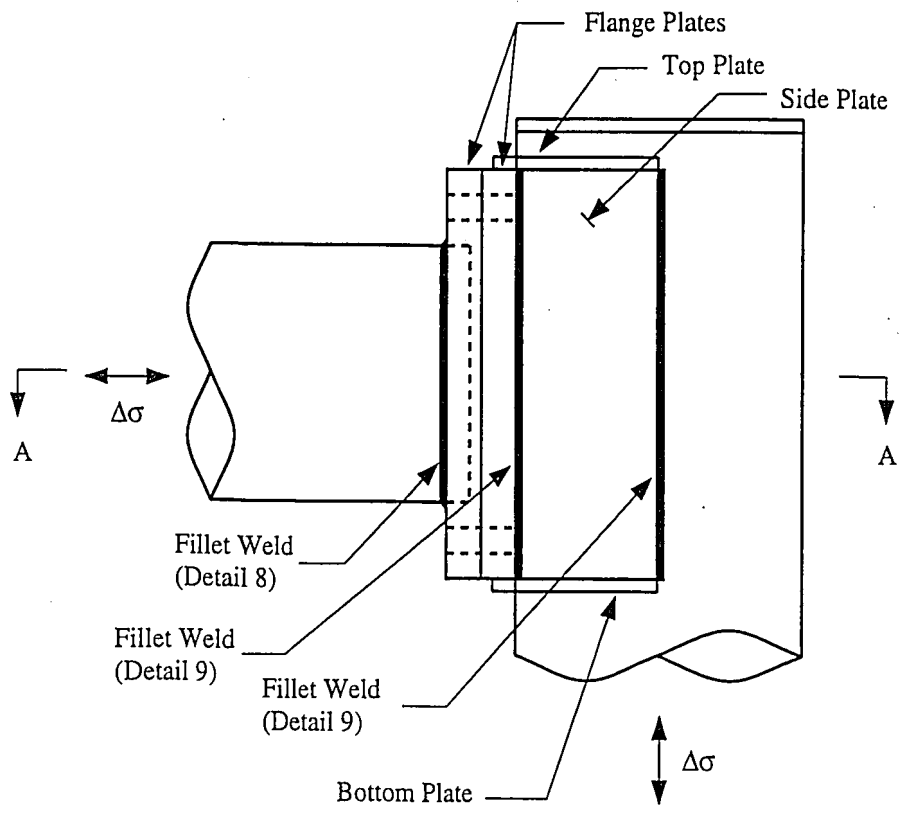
Fillet-Welded Mast-Arm-to-Column Connection (Built-up Box).
